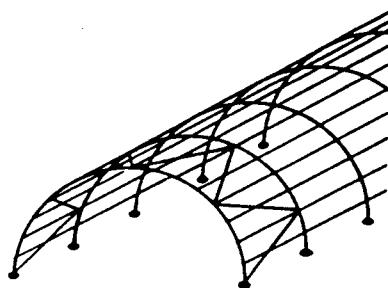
Wide span vaults with interconnecting bracings between the arched girders
